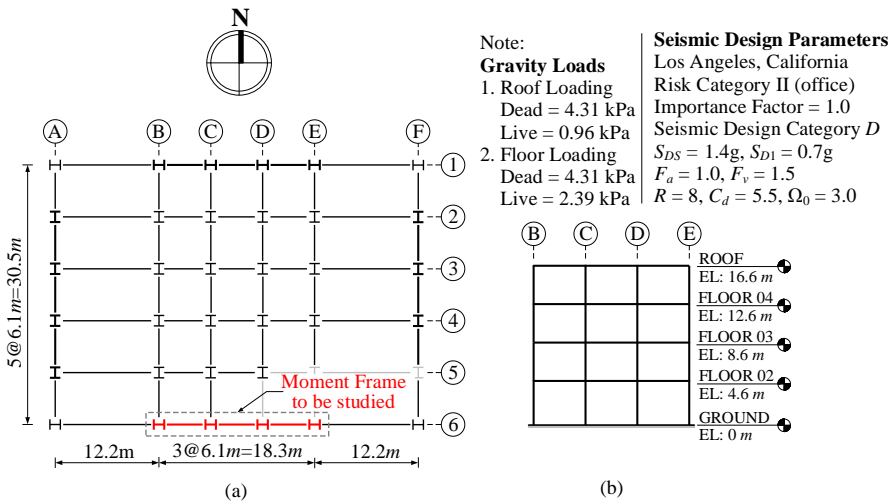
Typical archetype steel frame buildings: (a) plan view; (b) elevation of a four-story SMF
